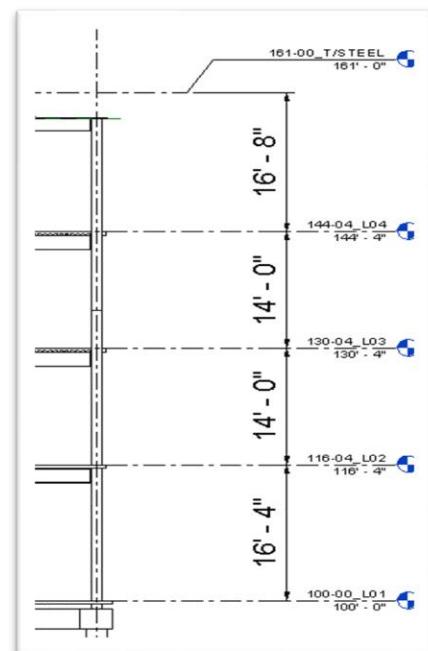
Example Levels in a BxP. The section shows the level of the building relative to finish floor at 100 ft for the local building coordinates.
